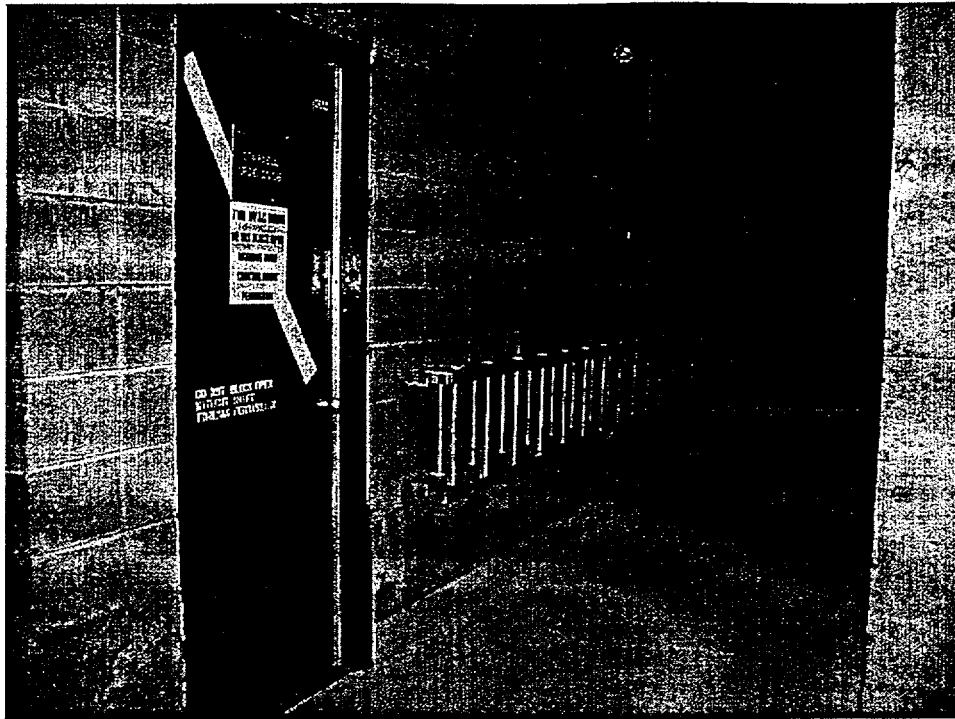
FHB El. 236' N, Stairwell Door and Ladder
